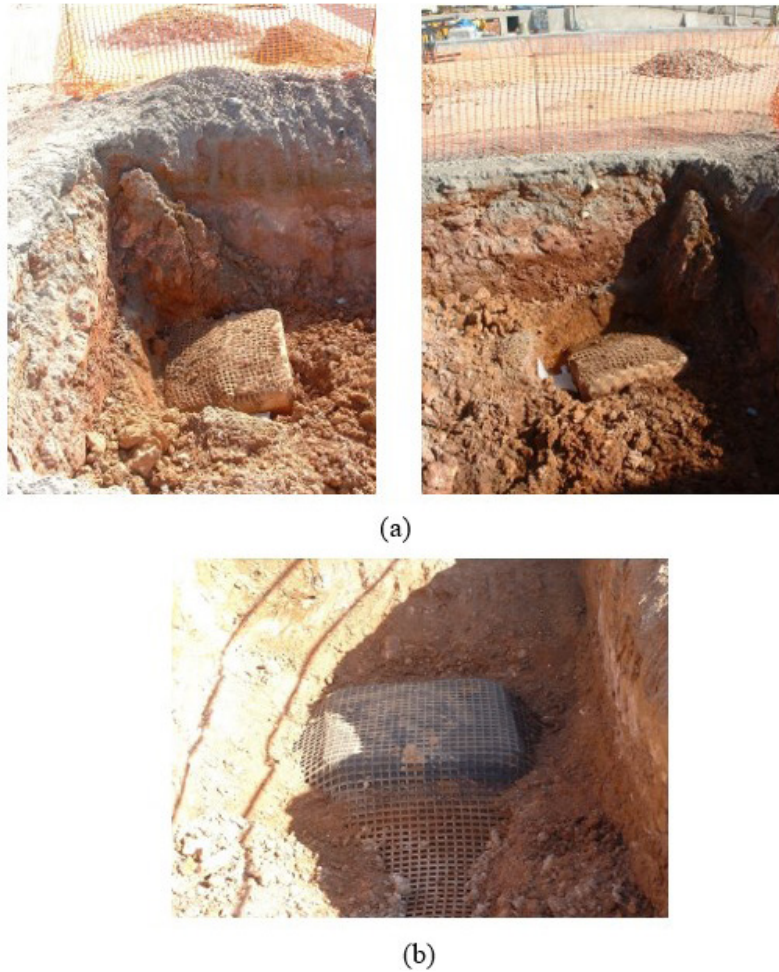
Example of failure of the reinforcement due to mechanical damage (a) reinforcement failure along cap perimeter; (b) protective geotextile layer between cap and geogrid reinforcement. (courtesy of Dr. Alberto Ortigão).
